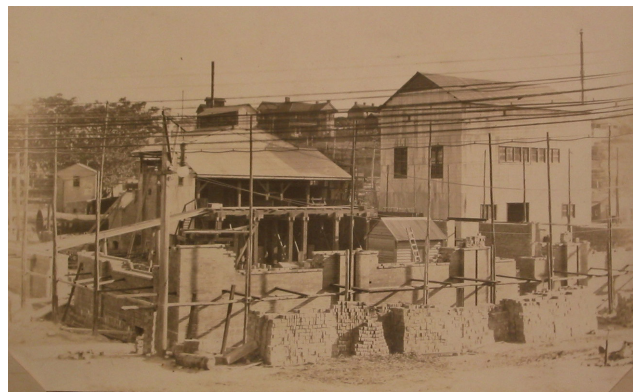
Temporary Boiler House (L) and Turbine House in 1913 (courtesy of Powerhouse Collection).
